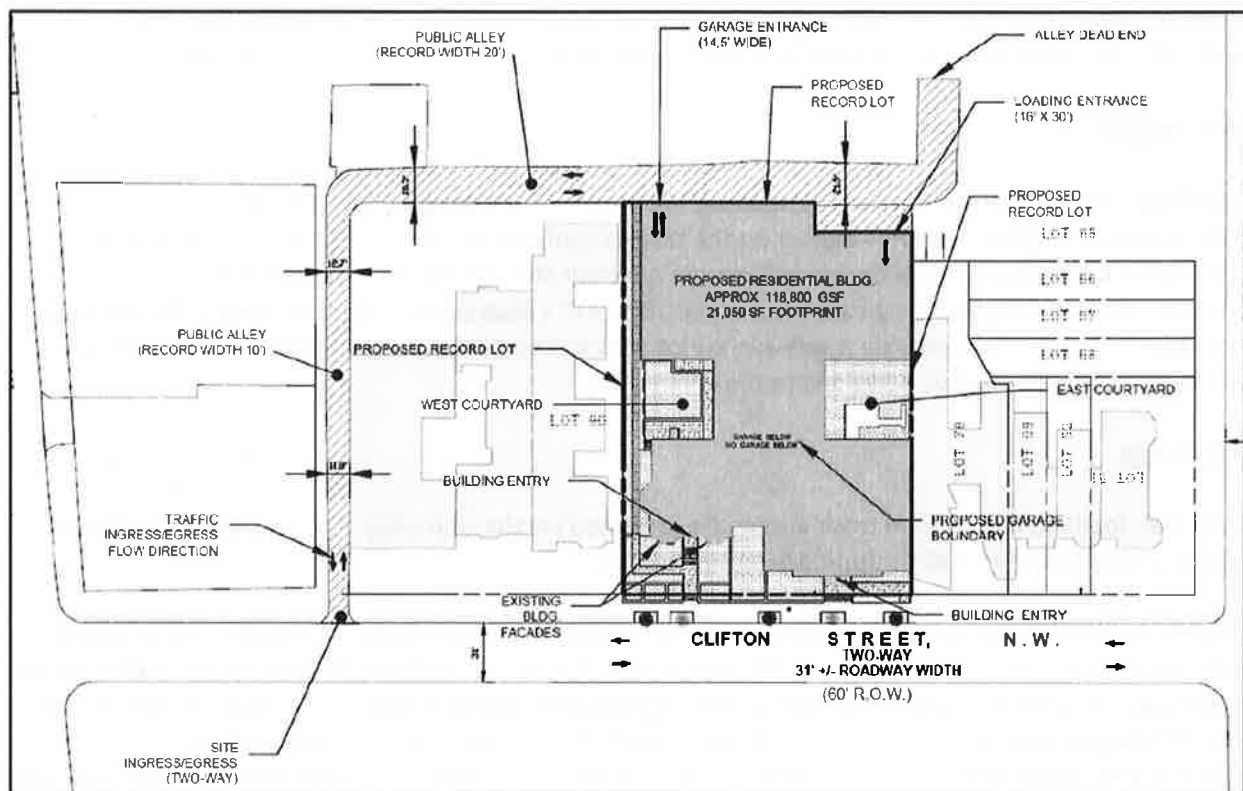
Site Design and Access (Source: Gorove/Slade)
